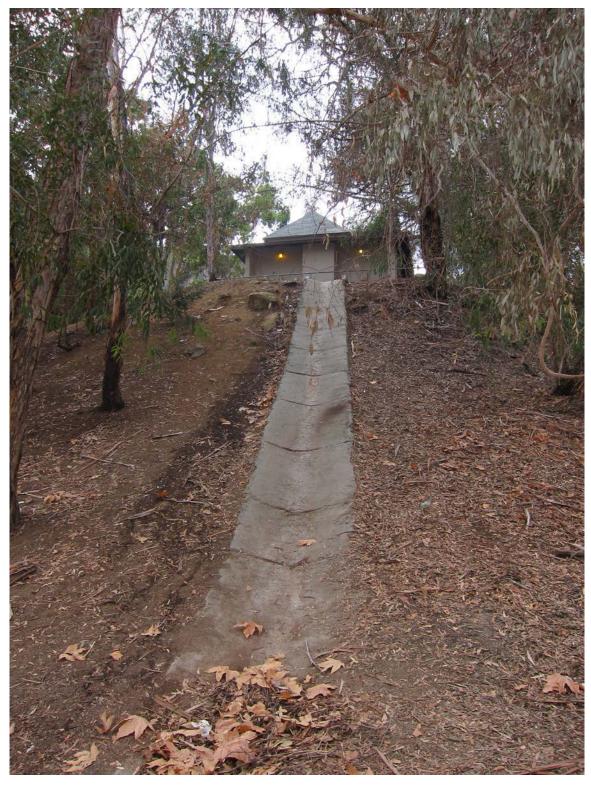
Facing southwest at the drainage located below the restroom building. This drainage appears to be in place to prevent erosion, and to channel water before it sheet flows to the east where it eventually dissipates.
